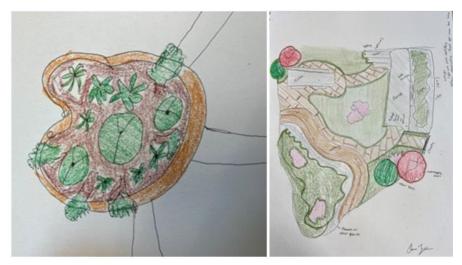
Jeremiah Murat's and Oscar Zelaya's site plan sketches of the rest area.
